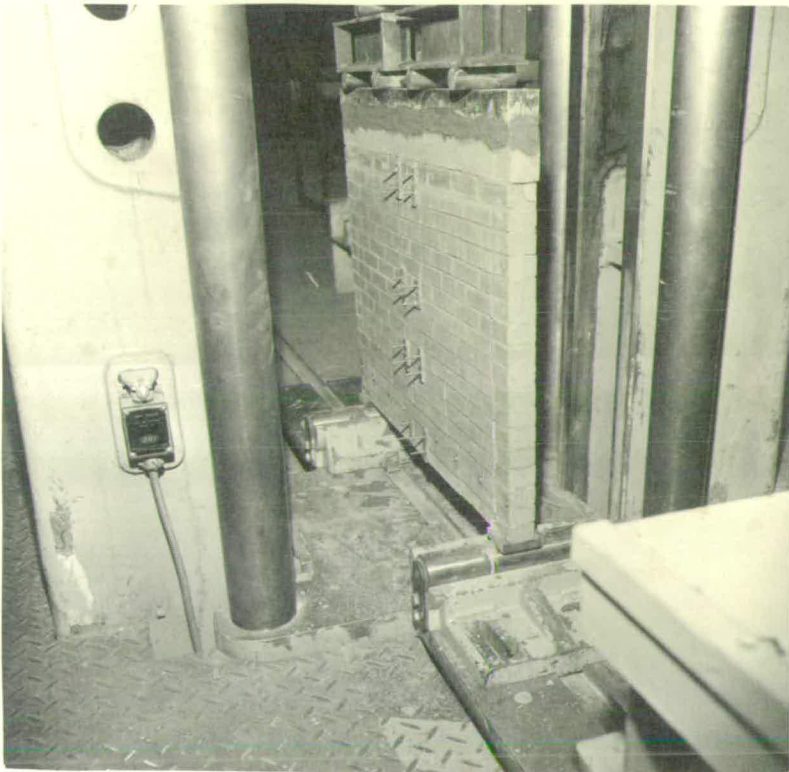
FAILURE OF WALL WITHOUT A SUPPORTING BEAM
